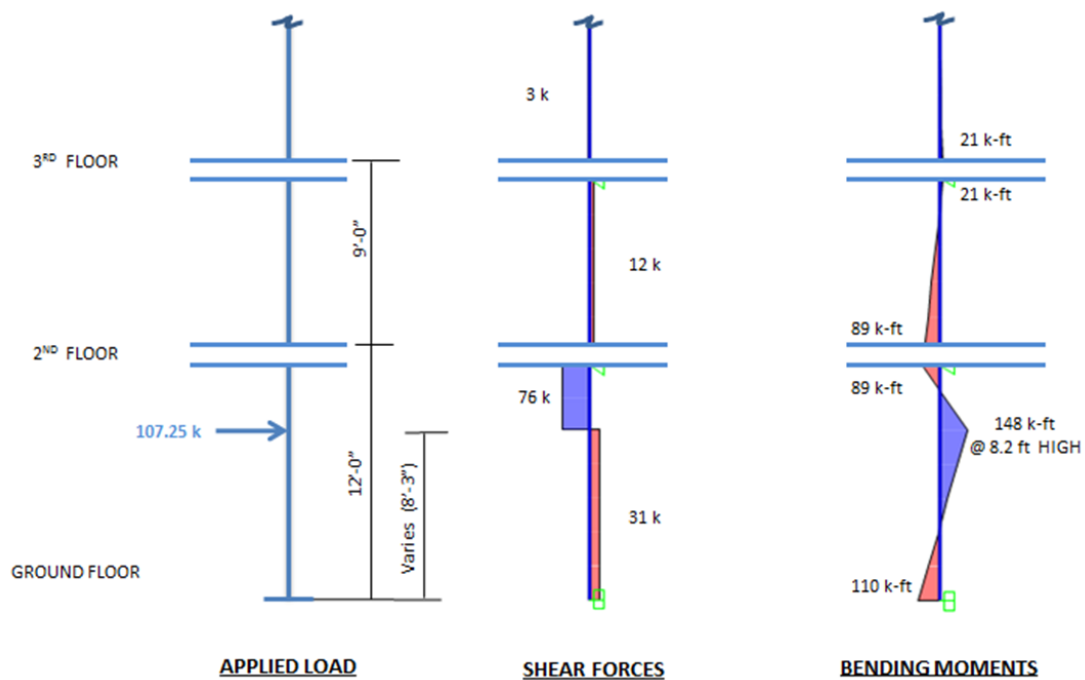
Impact load applied at " $d + h_c$ " away from the end of column on the ground floor
